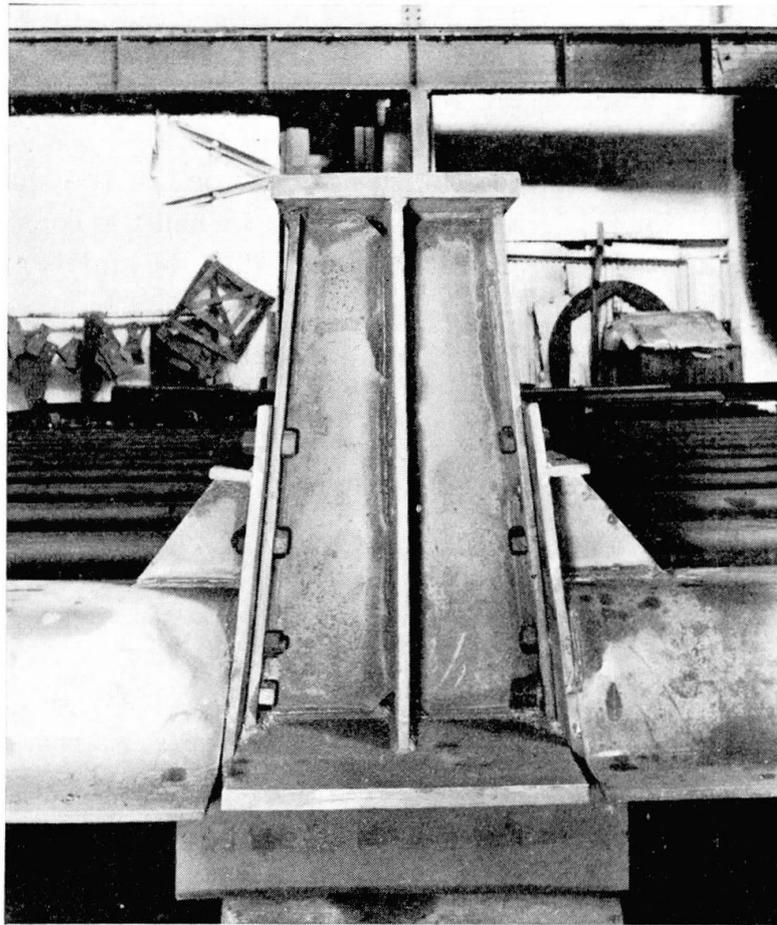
The bridge shown in fig. 11. Details of the bolted connections of the ballast plates to an intermediate main girder
